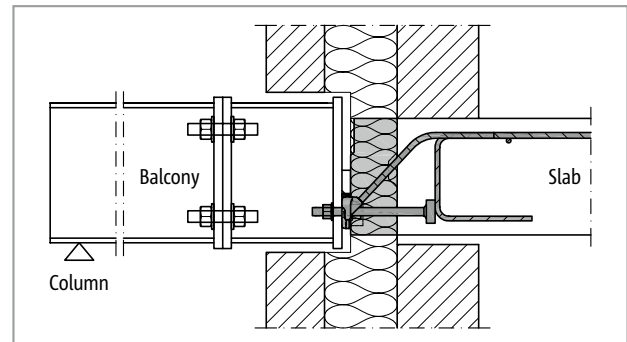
Schöck Isokorb® T type SQ: Insulating element within the core insulation zone; steel stub adjuster between the Isokorb® and the balcony for flexible construction workflows
